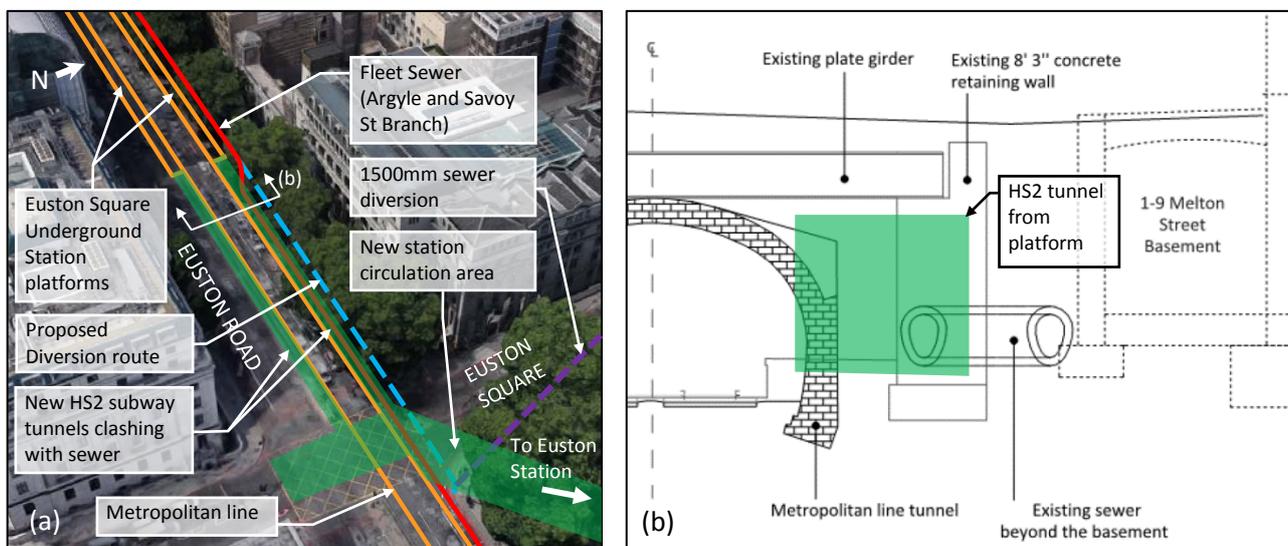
(a) The Fleet Sewer (Argyle and Savoy Street branch) in Euston Road showing the Metropolitan Line and the sewer diversion route (Google Maps imagery) (b) Cross section (looking west along Euston Road) of the sewer, basement and Euston Square Underground Station (courtesy of HS2)
